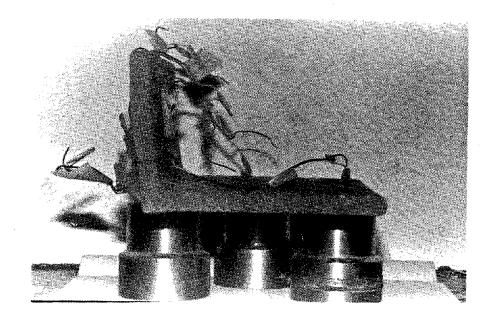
FLANGE ANGLE FROM SPECIMEN 14S2 AFTER TEST
